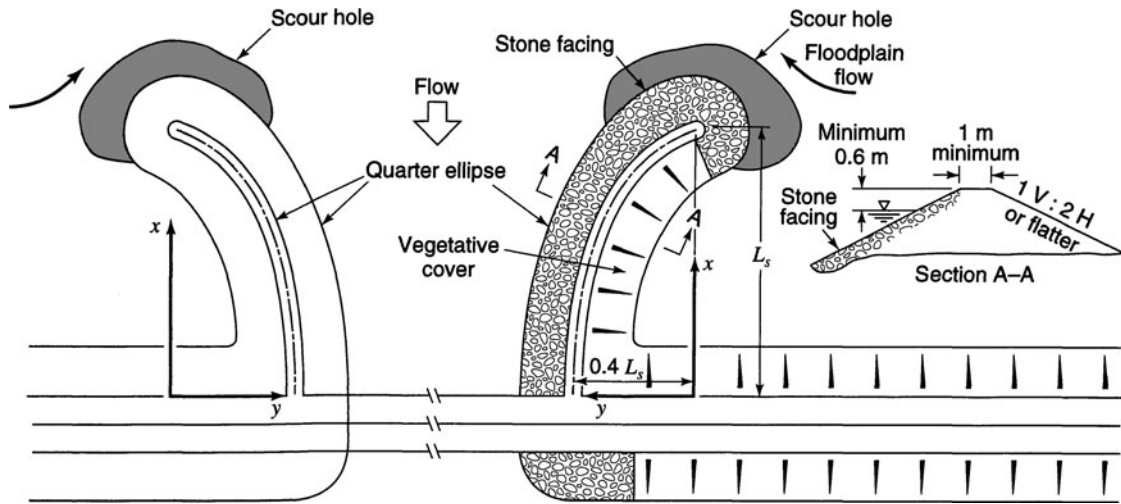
Typical guide bank (modified from Bradley, 1978) (as presented in Lagasse et al., 2001a).
